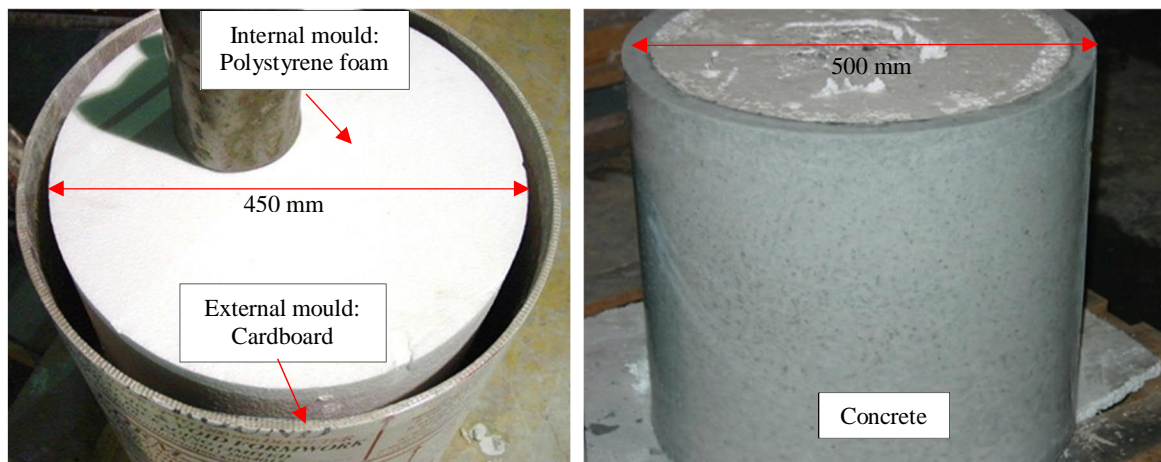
Internal and external mould for casting the concrete segments by pre-cast manufacturer
